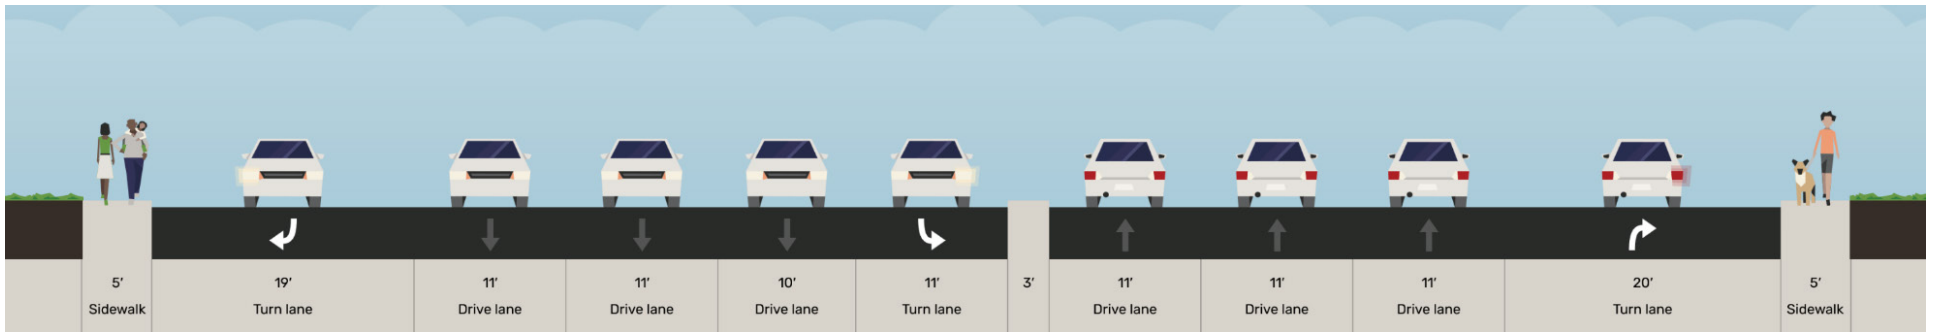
Existing cross-section: Crenshaw Blvd from I-105 eastbound on-ramp to W 120th St
